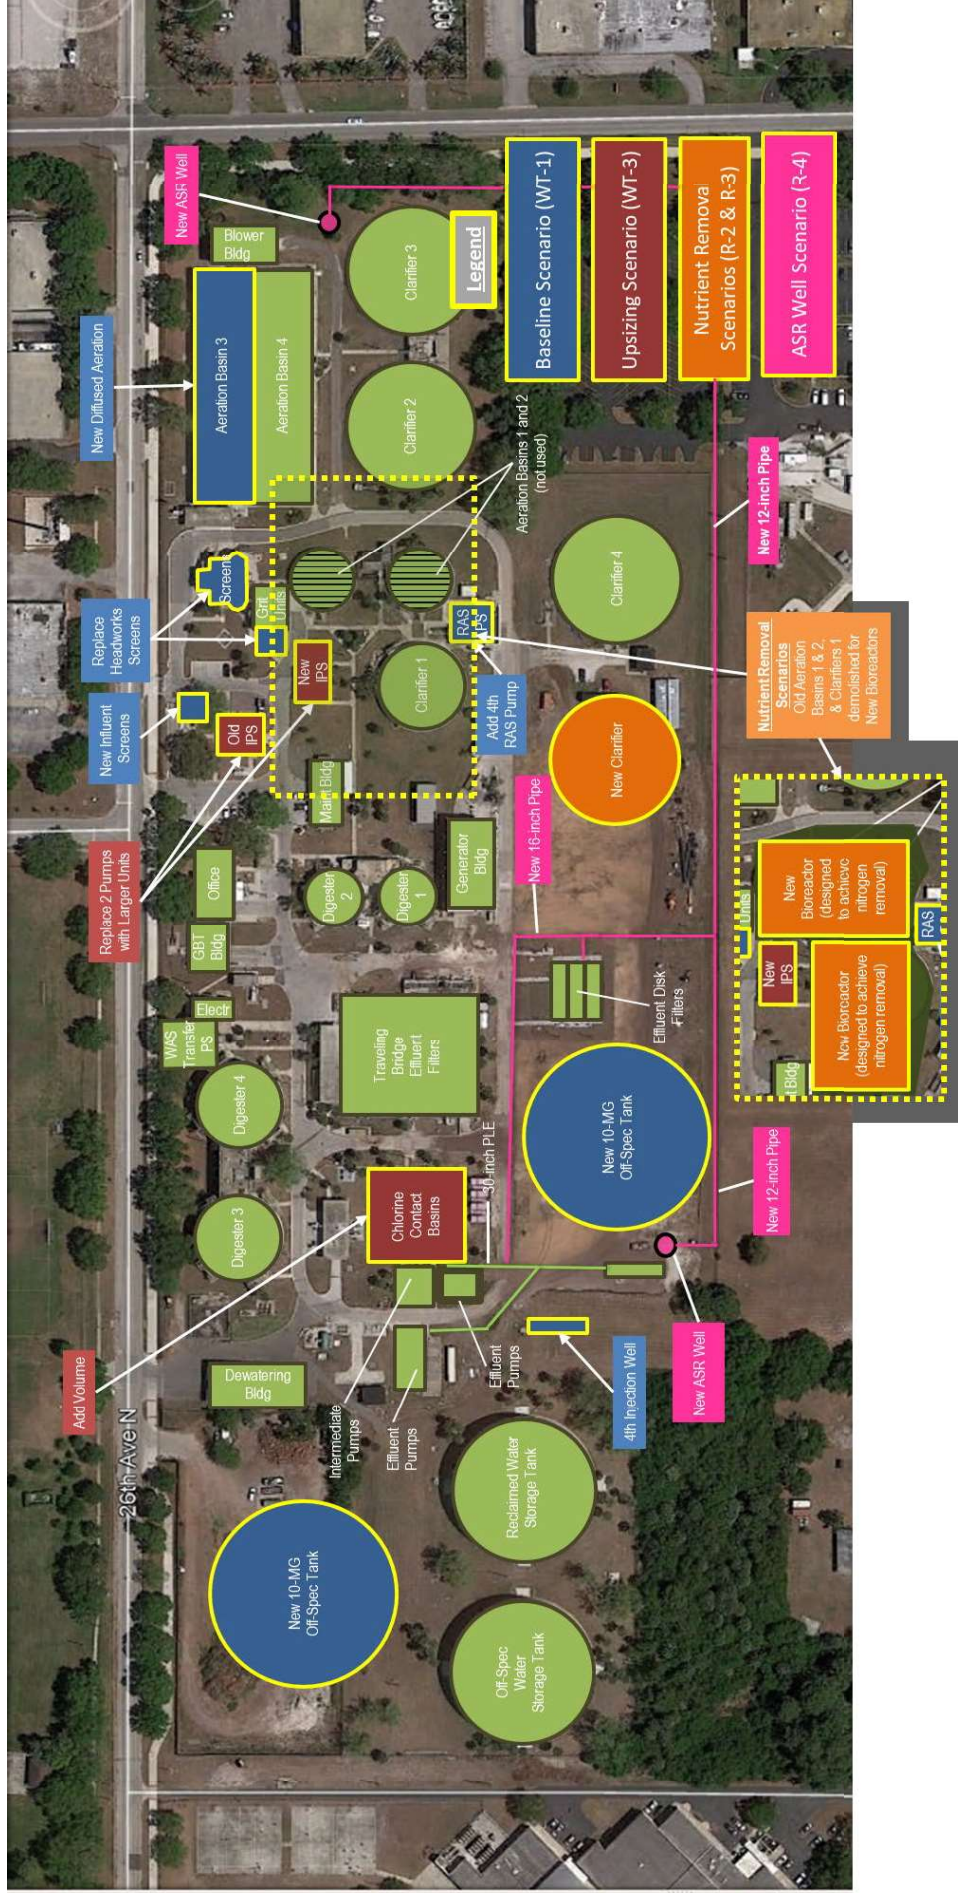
Site Layout Plan for the Northwest WRF
